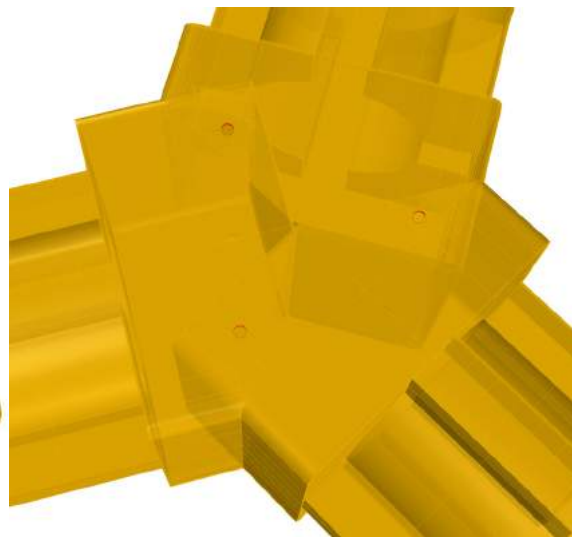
detail of the position of the holes (top and bottom) to be robotically drilled
